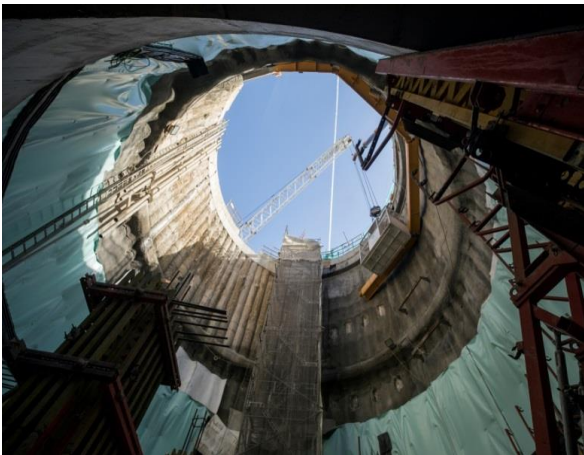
The temporary propping has been installed at Kennington Park head-house.
